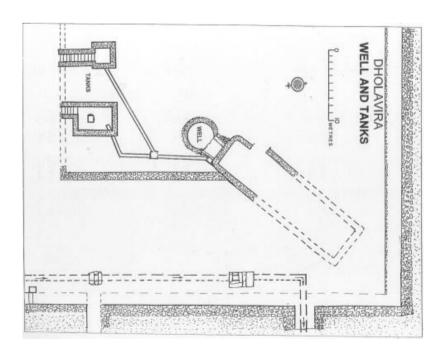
Plan of tanks and well in the castle, Dholavira⁵
